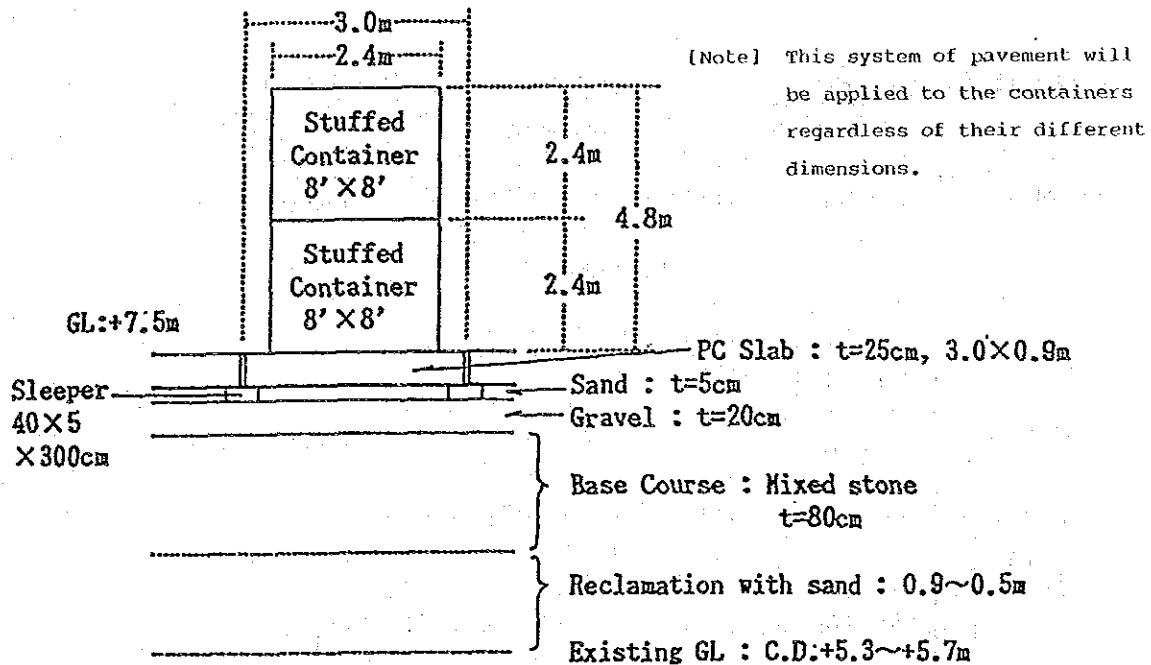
Pavement for Stuffed Container Yard
